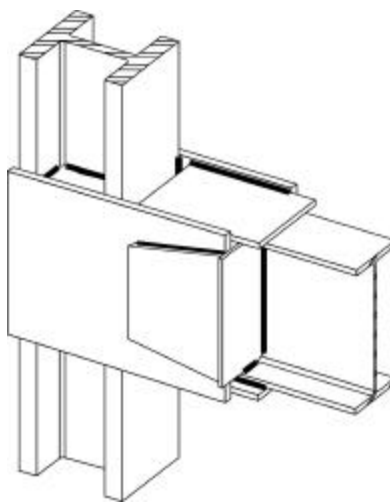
Proprietary Side Plate Connection – Application to Existing Construction
